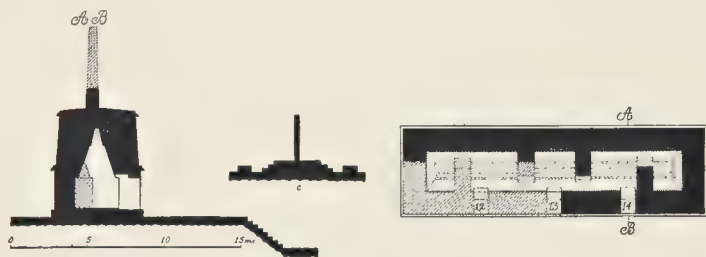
STRUCTURE 20: SECTION AND GROUND-PLAN (RESTORED).
